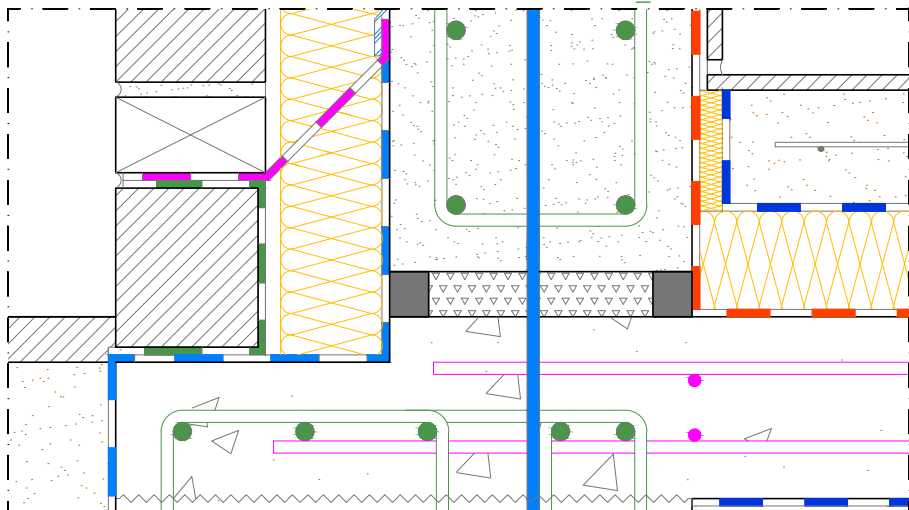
FACADE STARTING-WINDOW S:1/5
